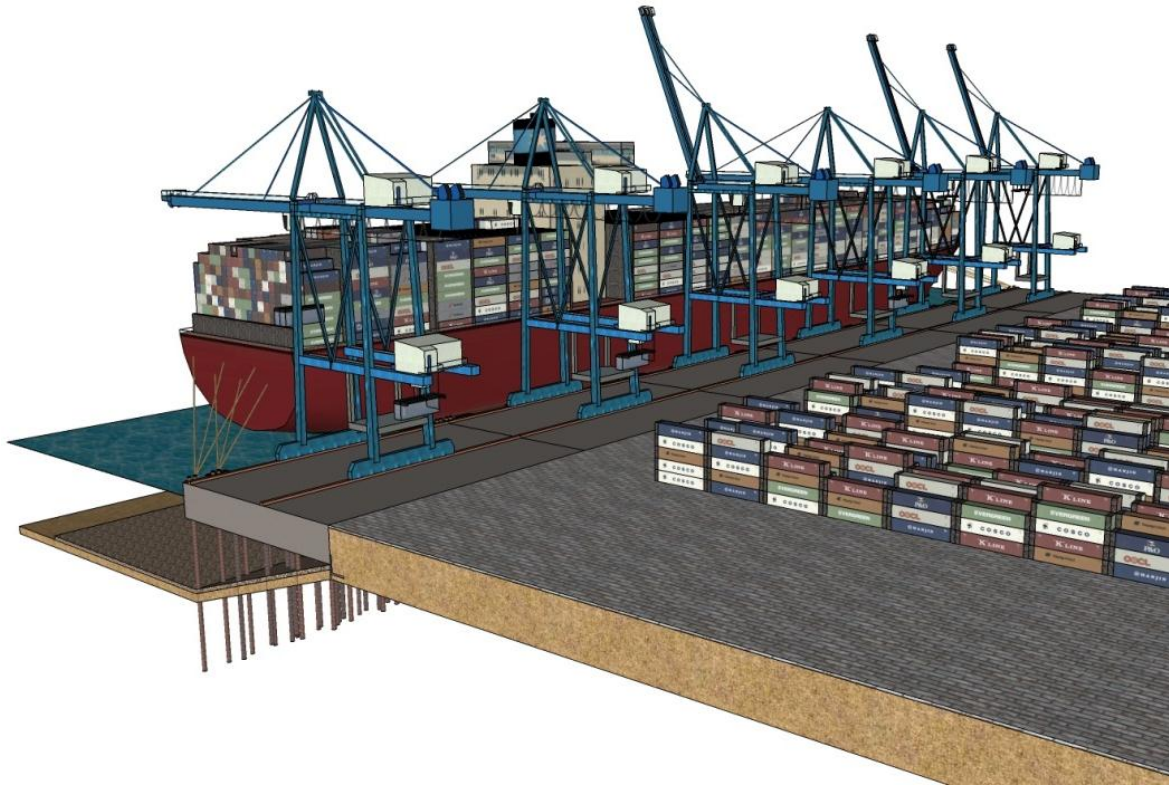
illustration operational immersed floating deck on a pile foundation
